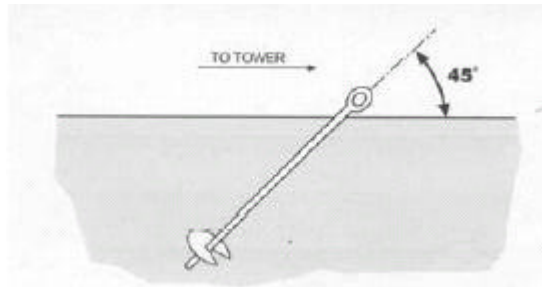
Install a screw-in anchor at 45° so that it is aligned with the guy loads.
